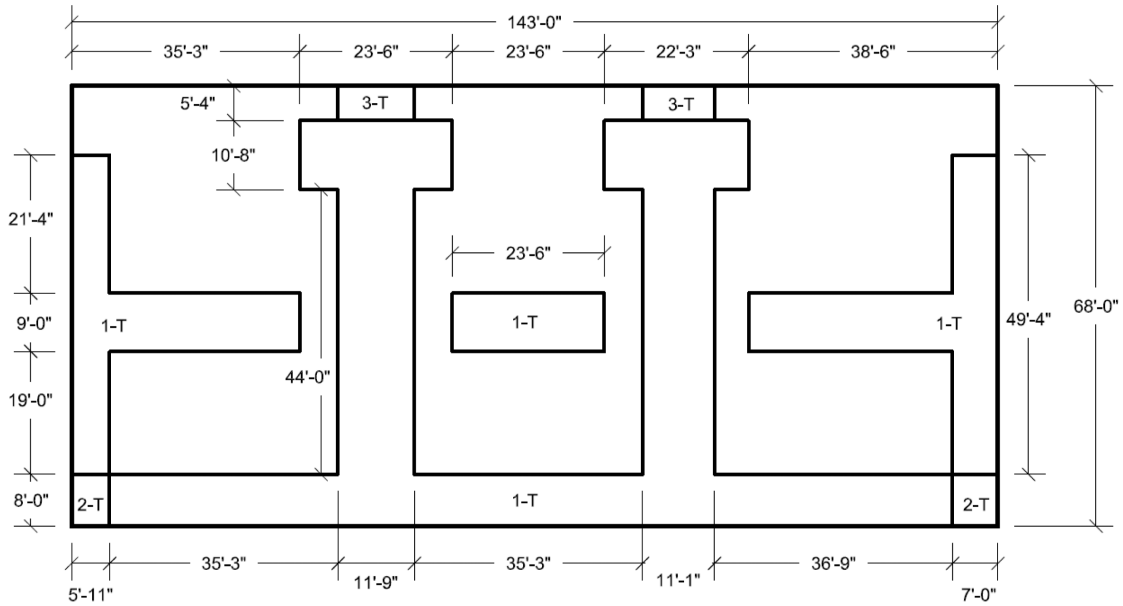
H.6-55 Pump House North Wall Looking South Transverse Reinforcement Zones
